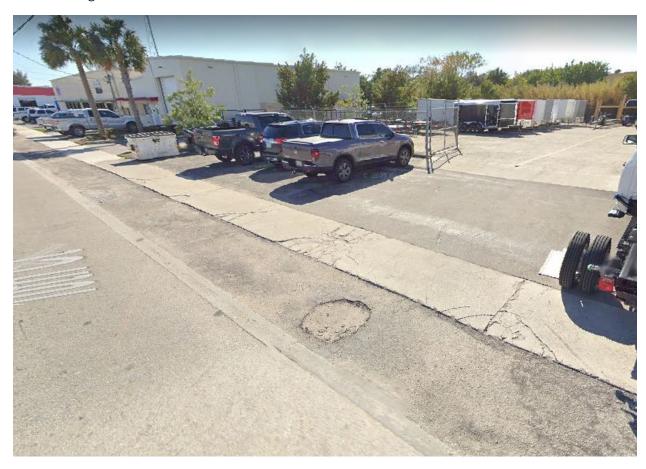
h Court holes in asphalt and cracked sidewalk showed unsafe conditions
